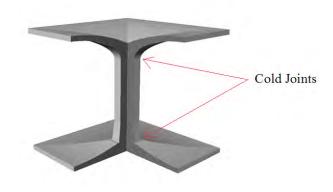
TYPICAL 14'x14' PANEL SECTION AROUND PIERS, MONOLITHIC PANELS
